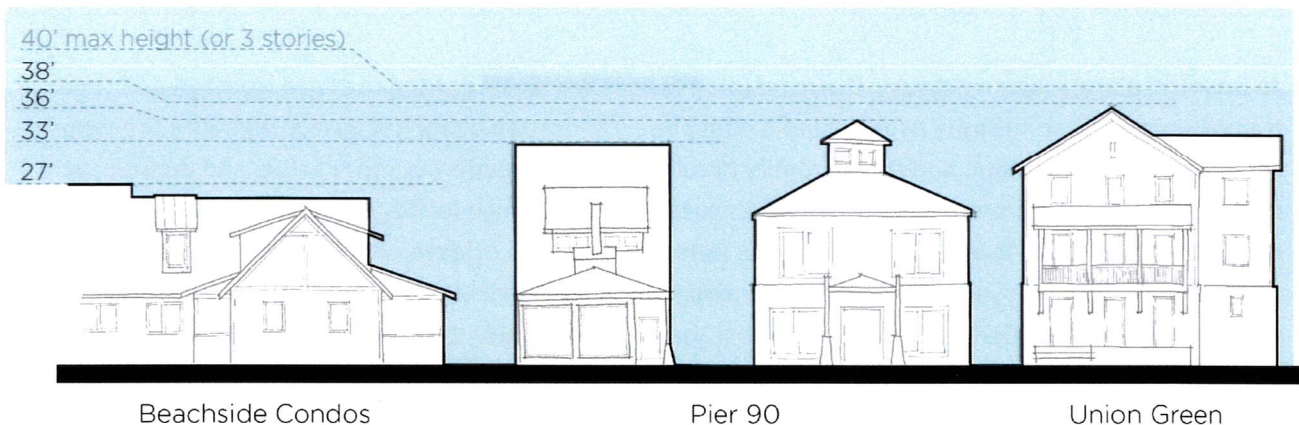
View from Goodwin illustrating building heights and spacing between units along the street
